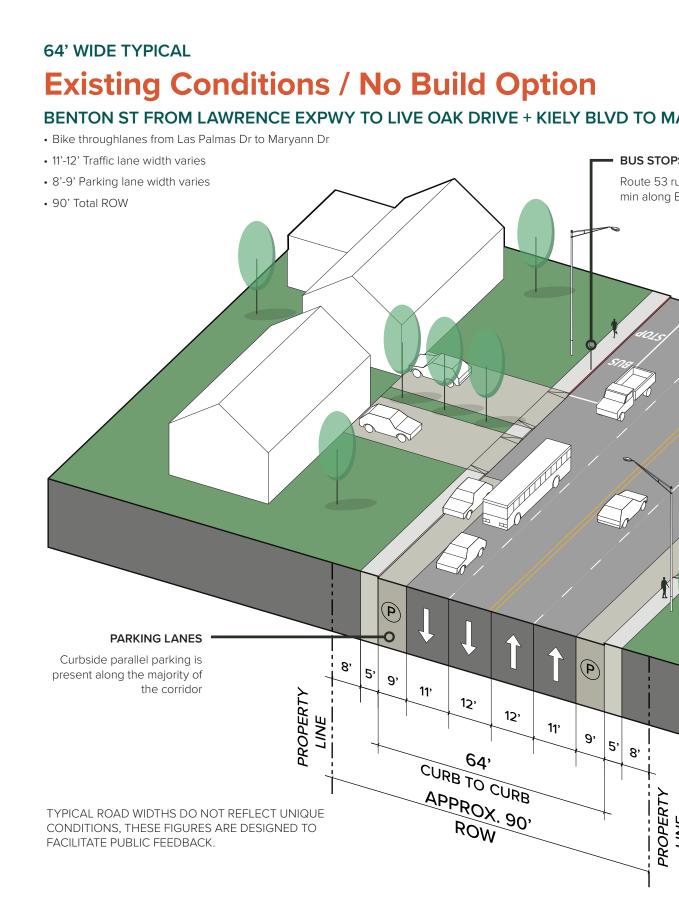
Existing Conditions/No Build Cross-Section – 64-Foot Segment
